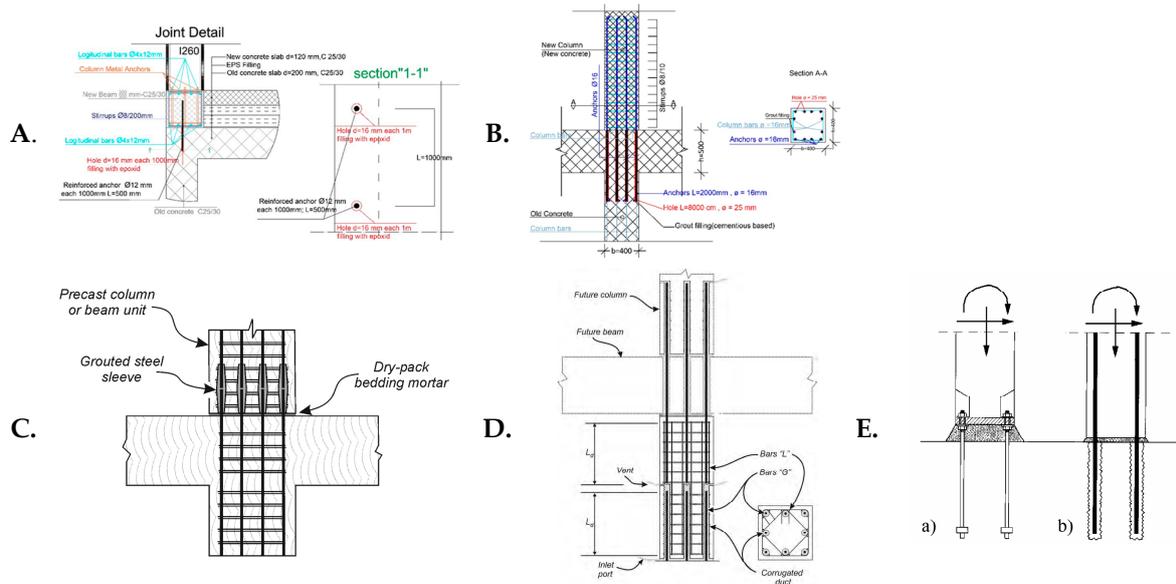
Several examples of connections executed in practice and from the literature (A,B) executed in Kosovo, ((C) [9], (D) [9], (E) [10]) for the addition of floors and prefabricated elements.
